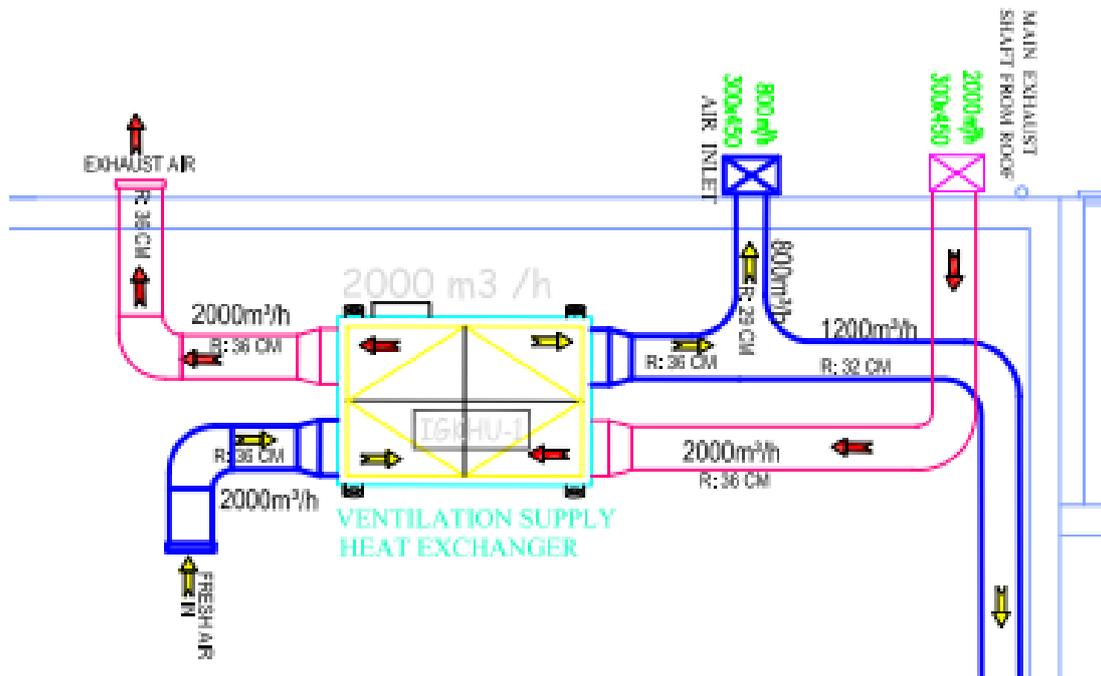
One of the four Heat Exchangers at the roof serving for EUPSO ventilation system
